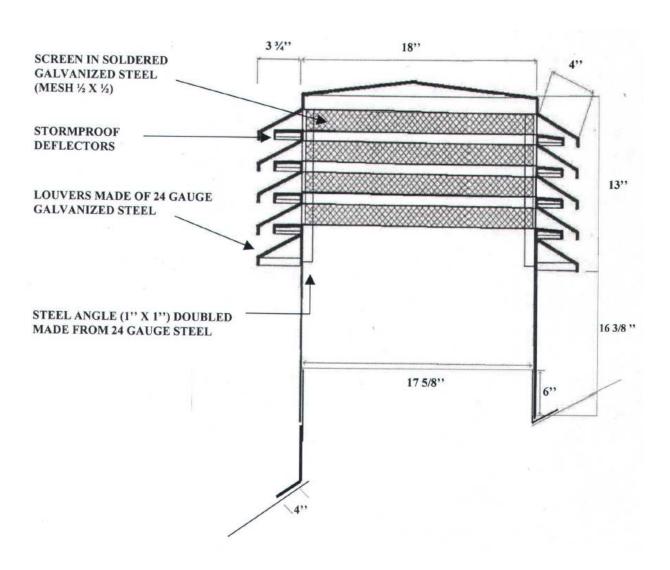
# DETAIL DRAWINGS (CONT.) ROOF VENTILATOR #301 (16 x 16)
